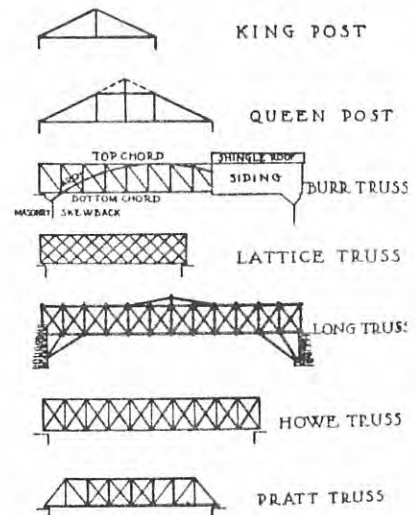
American timber truss bridges of the 1850's. The Howe, Pratt and later the Whipple trusses proved to be economical and durable when adapted to iron and steel construction.
